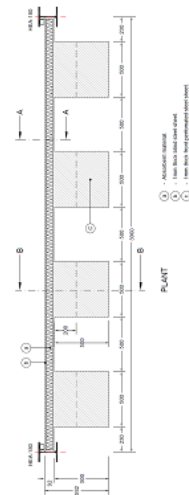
(Example) Plan view of the noise barrier (Dimensions in millimetres). g: mineral wool; b: 1 mm thick blind steel sheet; c: 1 mm thick front perforated steel sheet.
